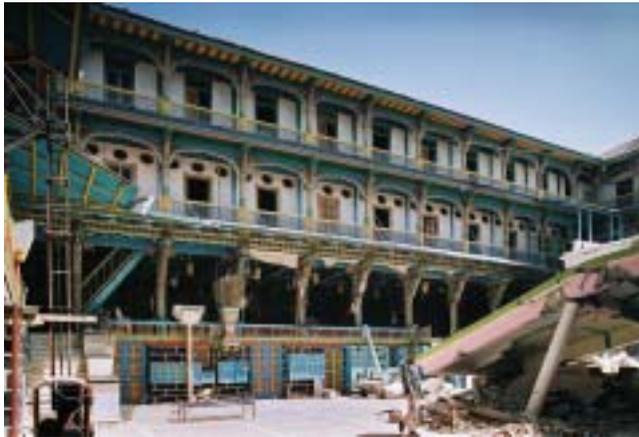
Bhuj, India, after the 2001 earthquake showing widespread collapse of both reinforced concrete and unreinforced masonry buildings. © Randolph Langenbach, 2007.
